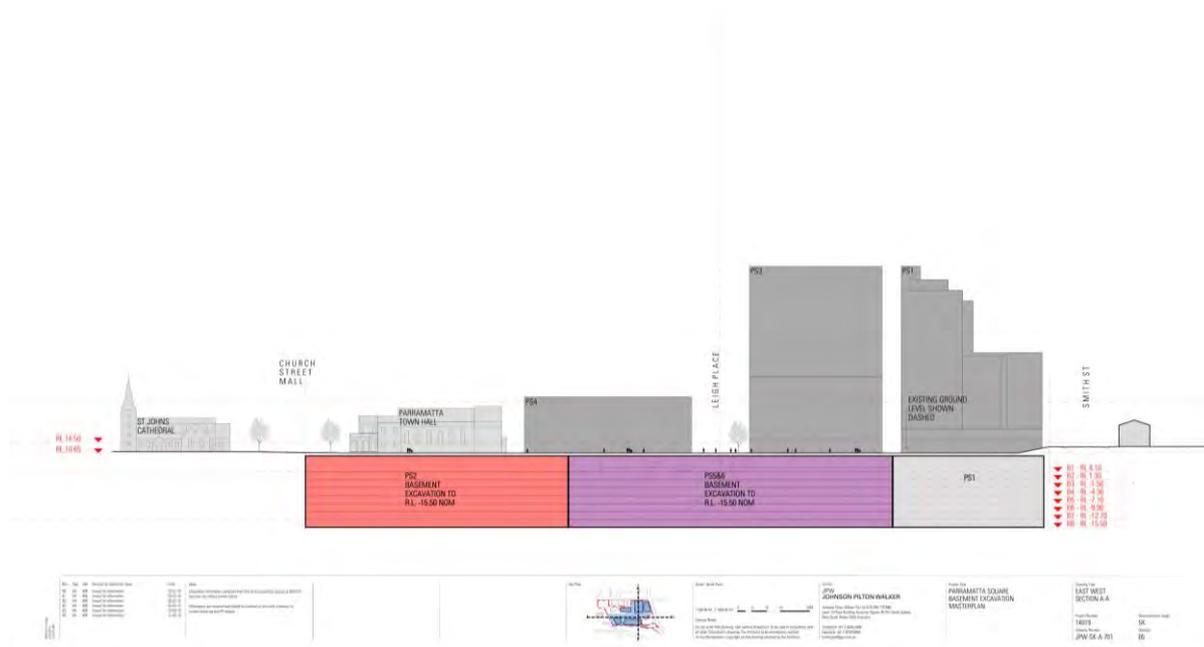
Elevation showing the below-ground basements, Parramatta Square Basement Excavation Masterplan, JPW, 31/03/2015.
